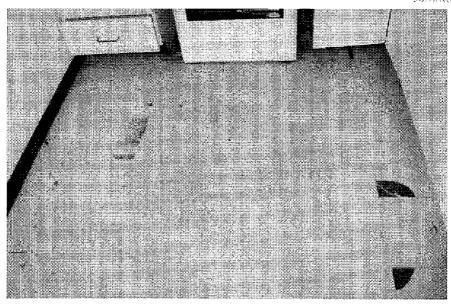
Beige vinyl floor tiles containing asbestos located in the kitchen of residential tenancy 89D Liverpool Road.
